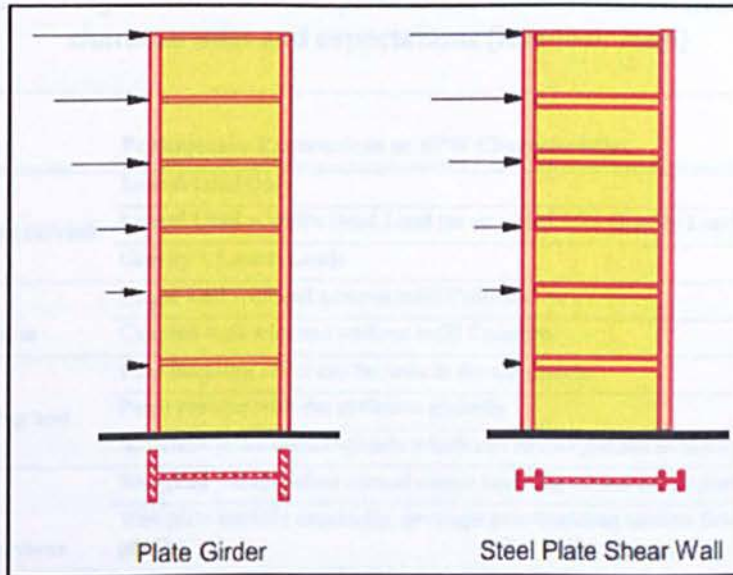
A comparison between plate girder and typical steel plate shear wall (Astaneh-Asl, 2001)
